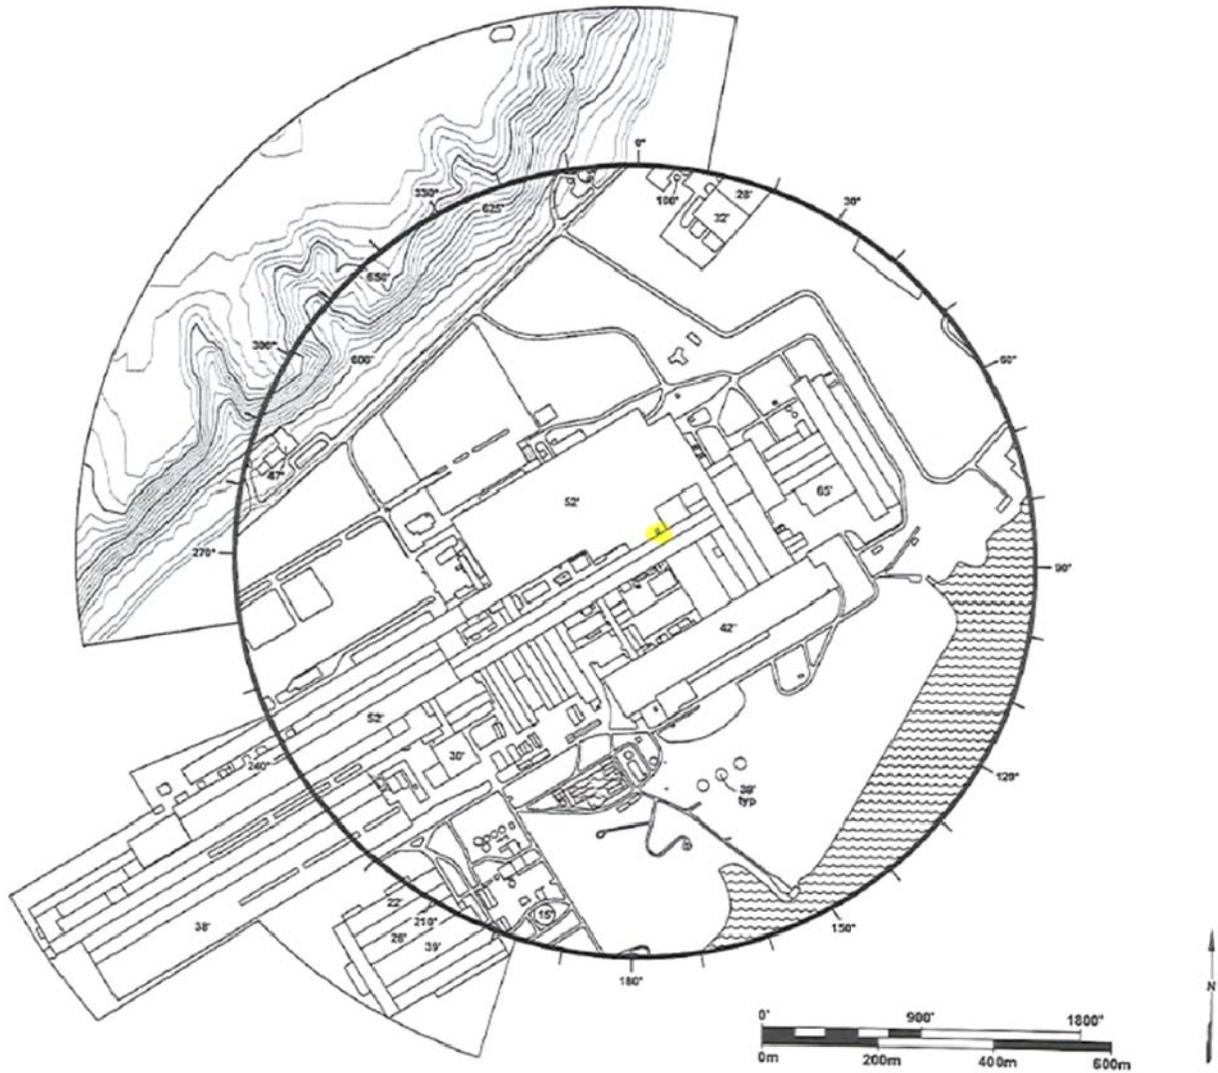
Alcoa Davenport Plant Layout (Figure 5, Part a, of CPP (2009))
